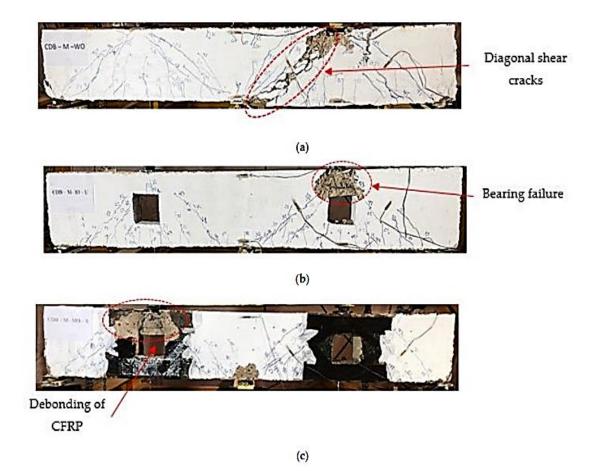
Failure Modes of Tested Specimens: (a) Specimen CDB–Solid, (b) Specimen CDB–O–U, (c) Specimen CDB–O–S [8]
